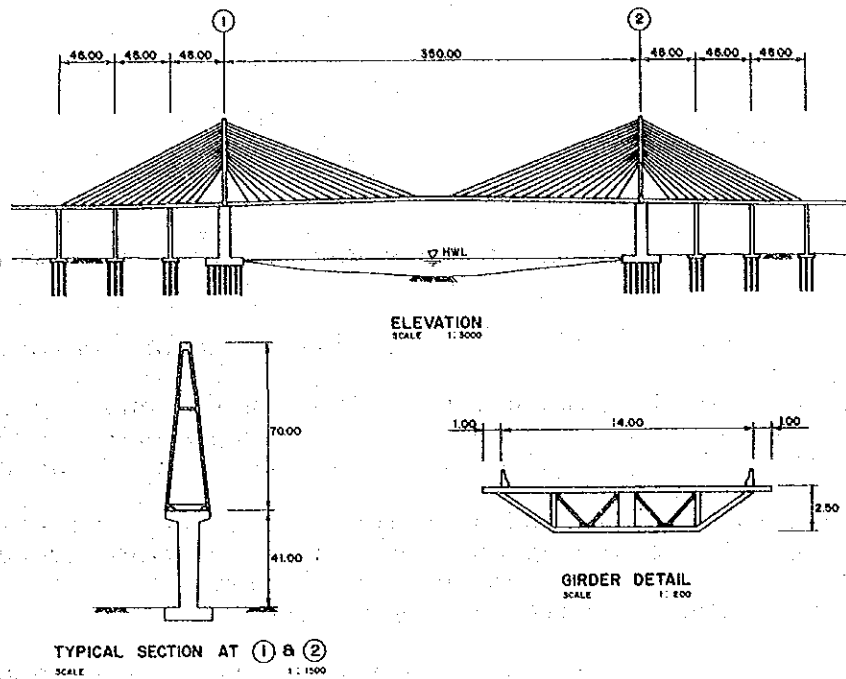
Typical Section of Cable Stayed Steel Wire Bridges
